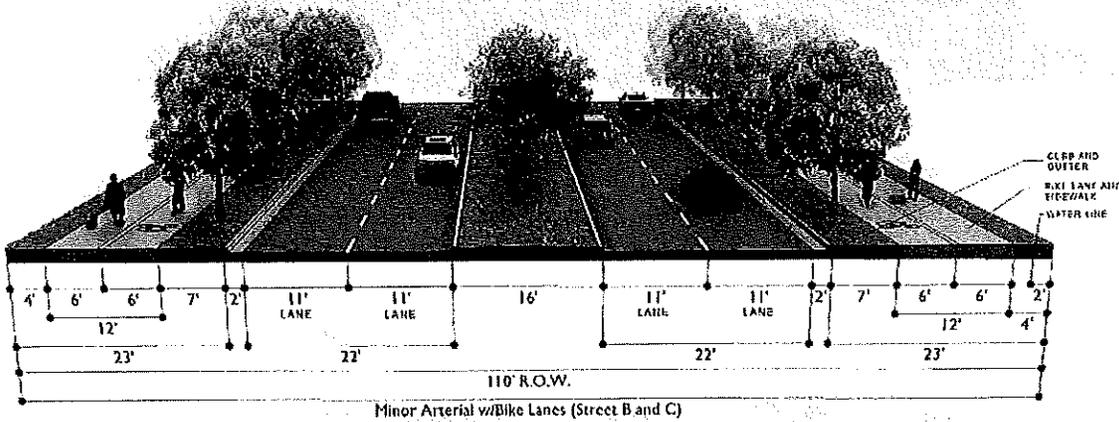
Proposed Street B Modified Minor Arterial 110' ROW
